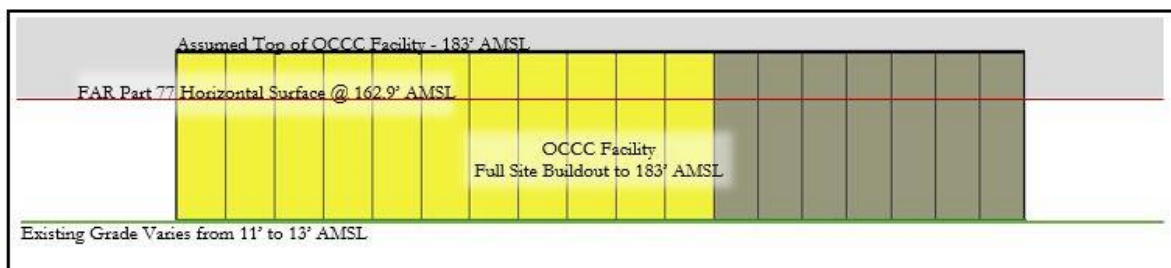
FAR Part 77 Horizontal Surface Profile with OCCC Facility Built to 183 feet MSL
